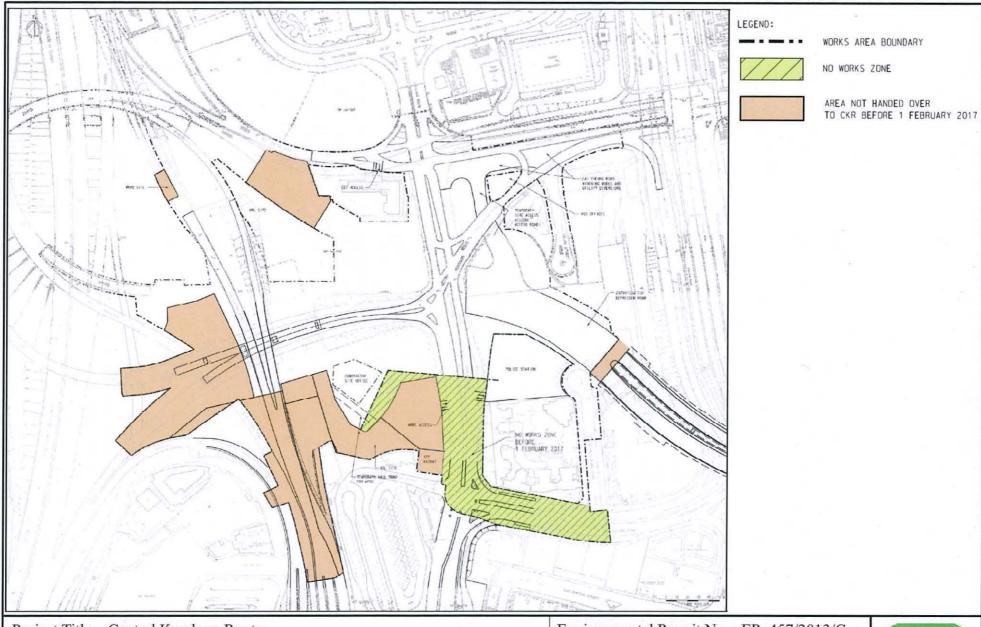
General Layout Plan of CKR 圖1 -中九龍幹線總平面圖
